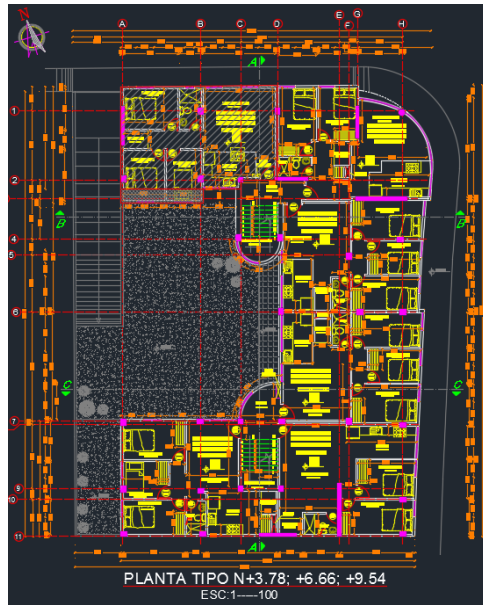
Architectural 2D Drawing 2nd Floor Plan
